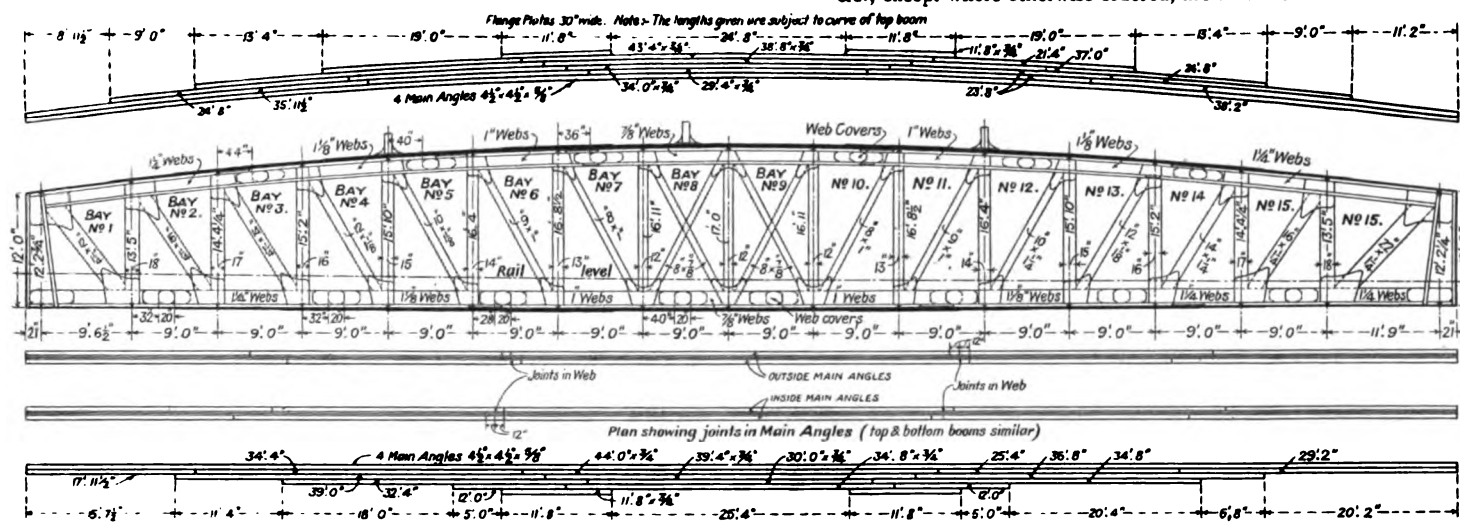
Bridge over North London R. Elevation of South Girder. Bow to East Ham Widening; L.T. & S.R.
